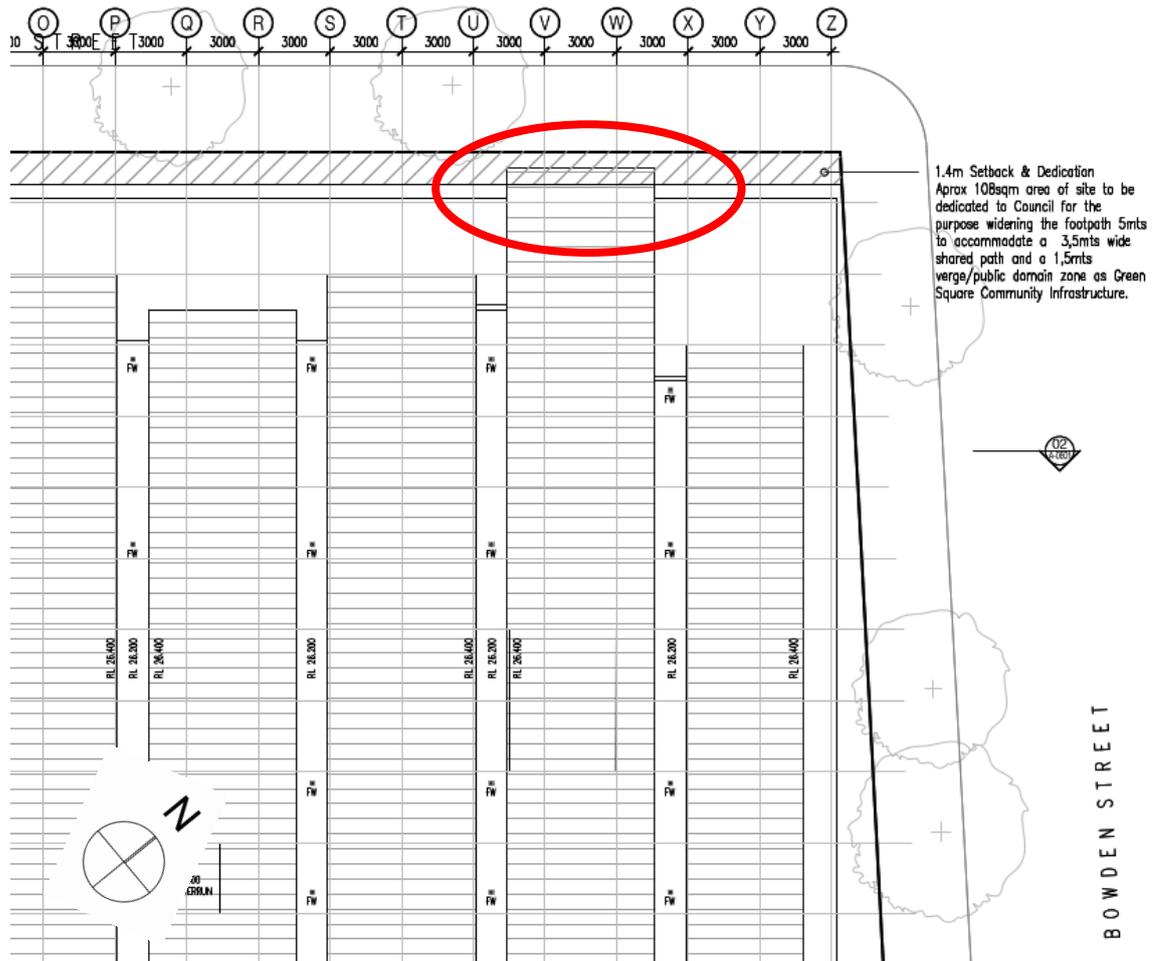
Roof plan showing building element projecting over McEvoy Street land dedication.
